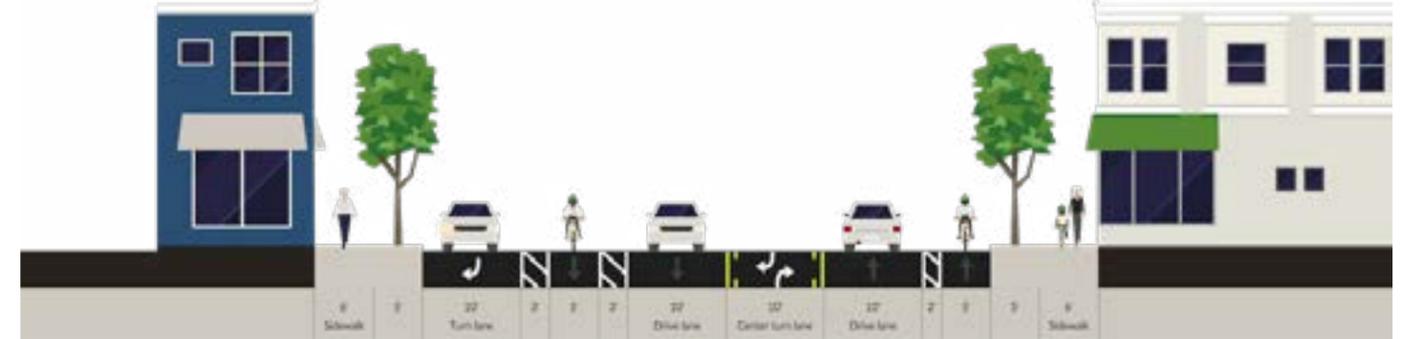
Potential Rochester Road/14 Mile Intersection Complete Streets improvement
